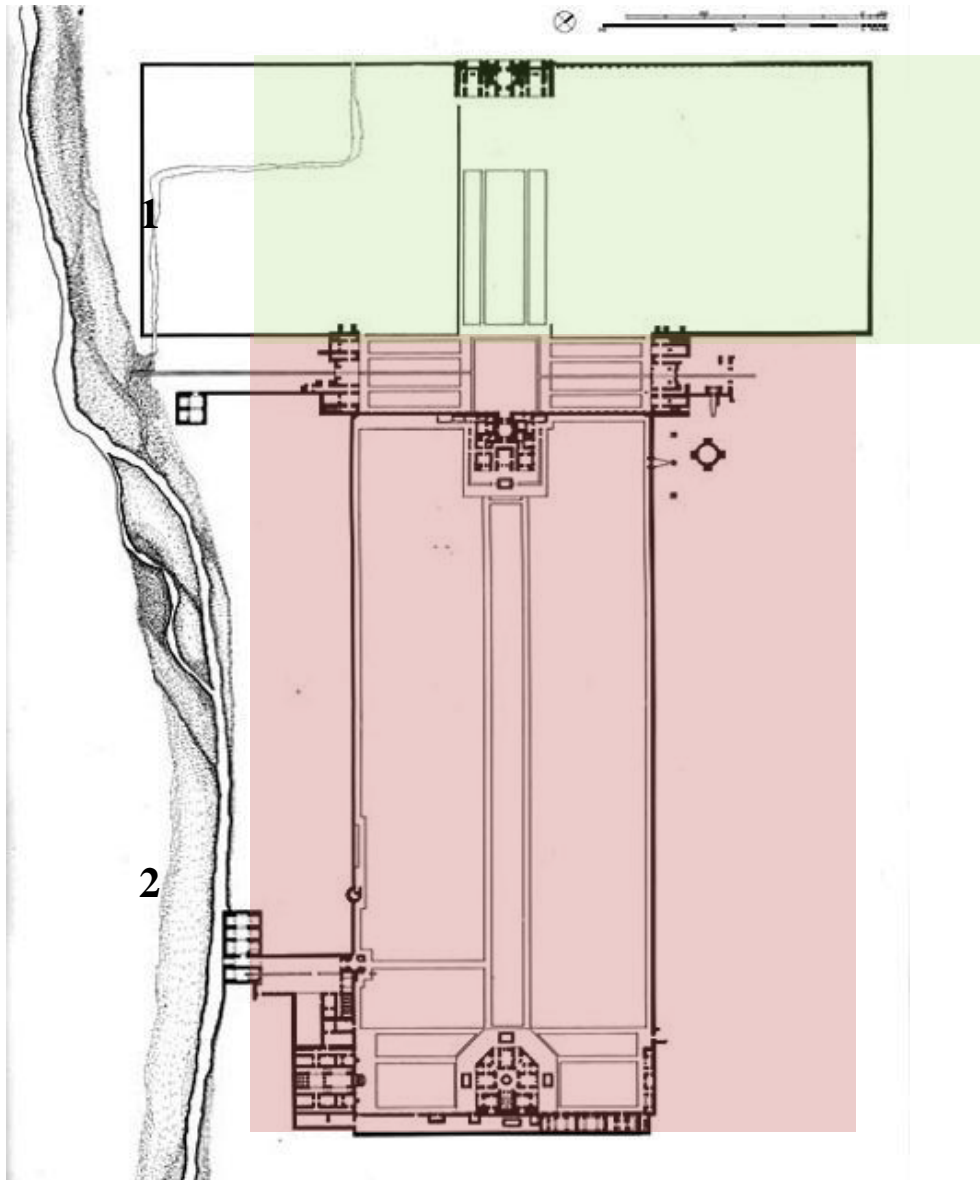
SITE PLAN OF DOLATABAD GARDEN; 1. EXTERIOR GARDEN AND 2. INTERIOR GARDEN (HERDEG, 1990)
